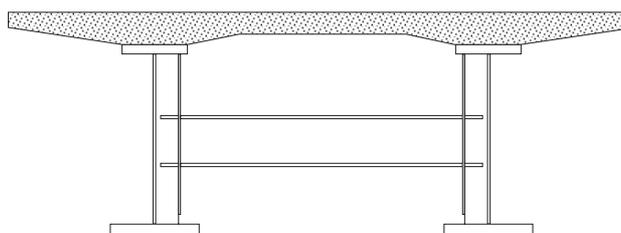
Usual transverse cross-sections of a composite twin-girder bridge.
